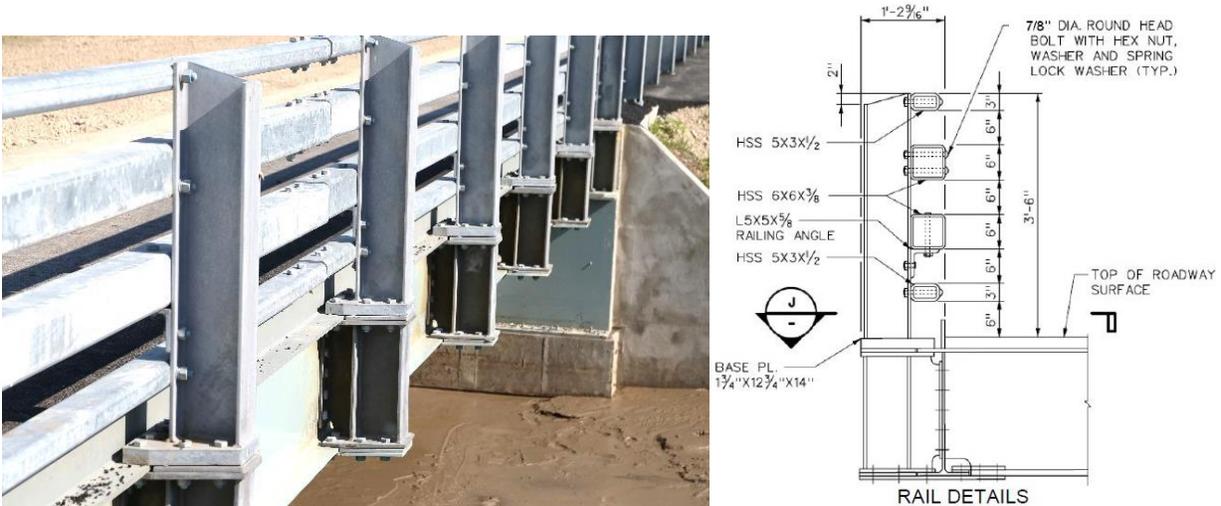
NYC Verrazano-Narrows Bridge Rail [22]
